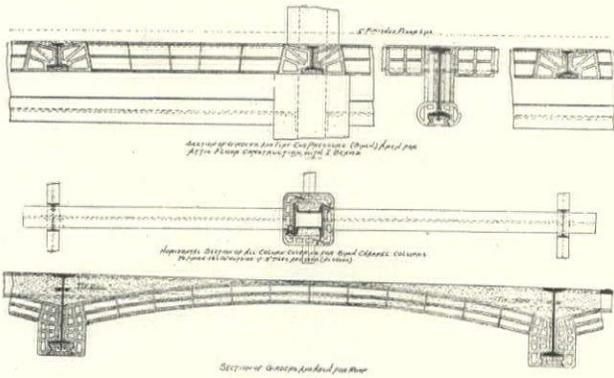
SECTIONS OF END-PRESSURE, FLAT ROOF-ARCH AND GIRDER; ALSO END-PRESSURE SEGMENTAL ARCH. SAME ALSO SHOWS SECTION OF STANCHION-COVER CRAMPED WITH STEEL AND FILLED WITH CONCRETE. DESIGNED BY THE AUTHOR.
